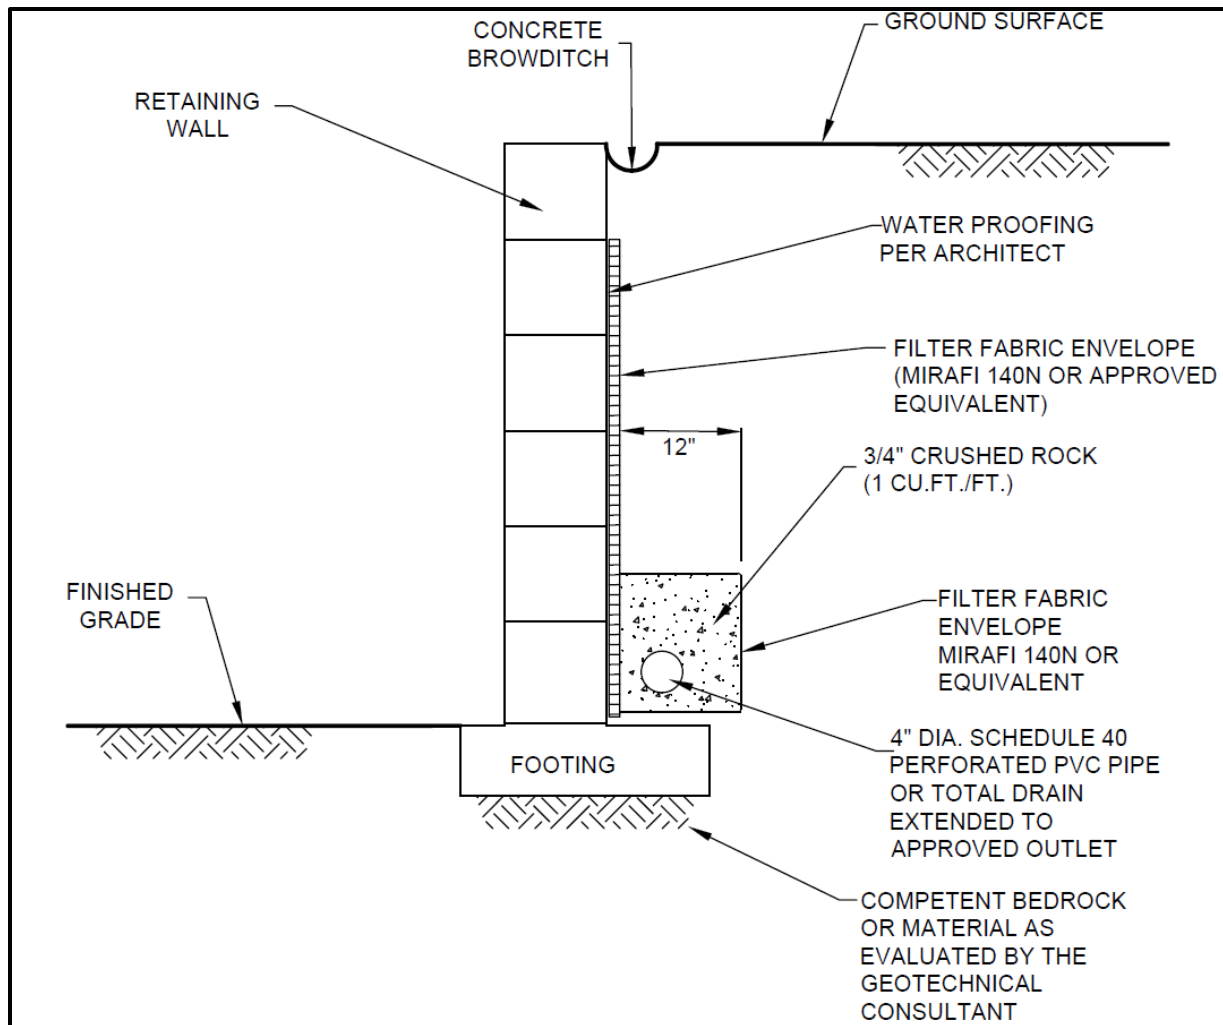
Typical Conventional Retaining Wall Backdrain Detail
